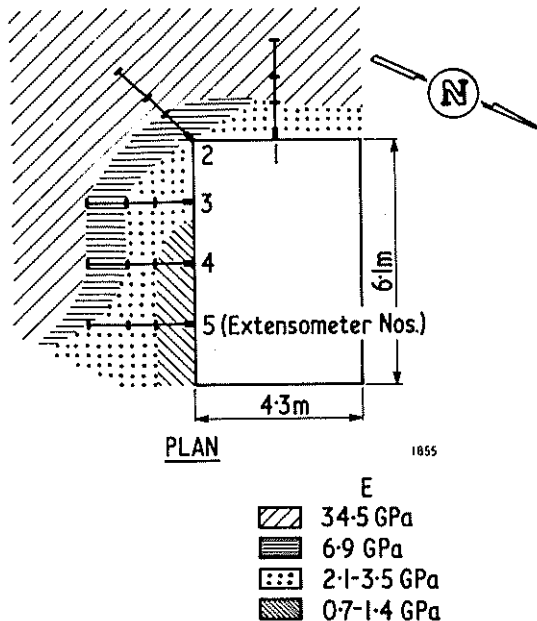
Observations in access shaft, Ramu No. 1 Project - installation arrangement and pattern of deformation modulus.
